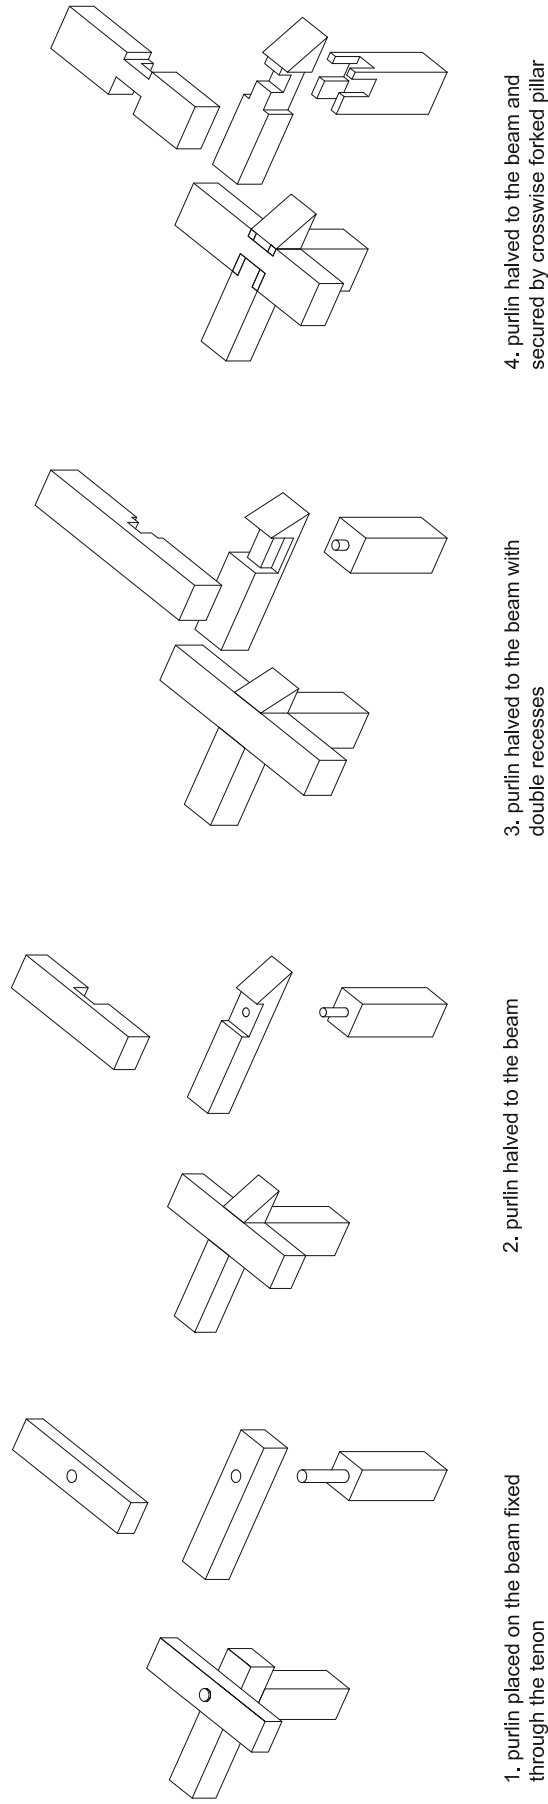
Assembling Techniques: purlin, crosswise beam, and pillar found in Lan Na region
